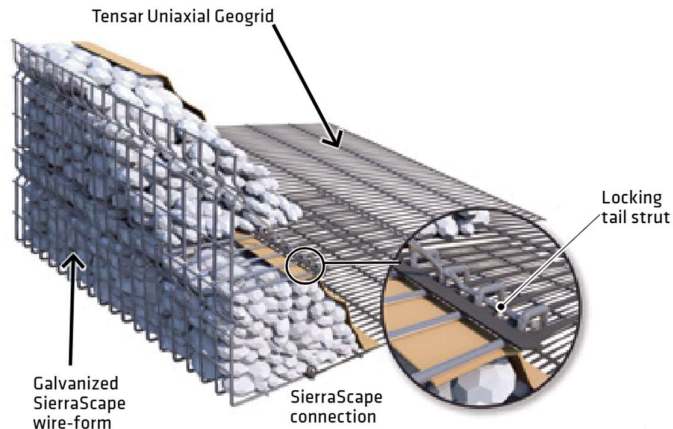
Schematic diagram of SierraScape Retaining Wall System
